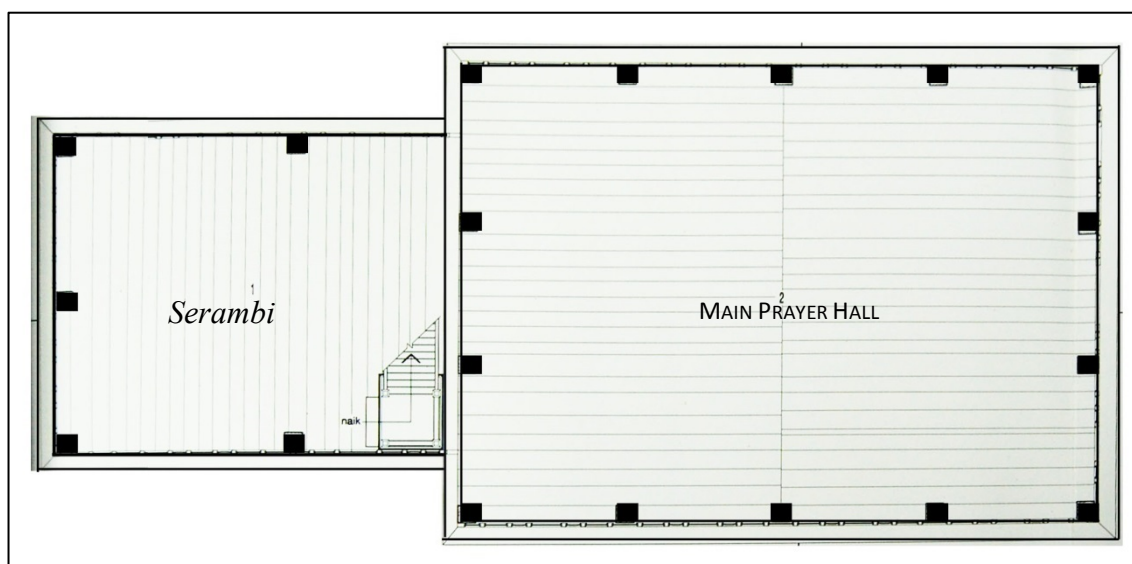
Masjid Teluk Manok floor plan drawing of the original building (without extensions)
